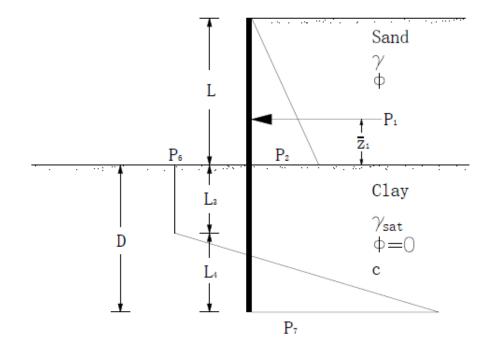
Cantilever wall penetrating clay (Das, 1999)
